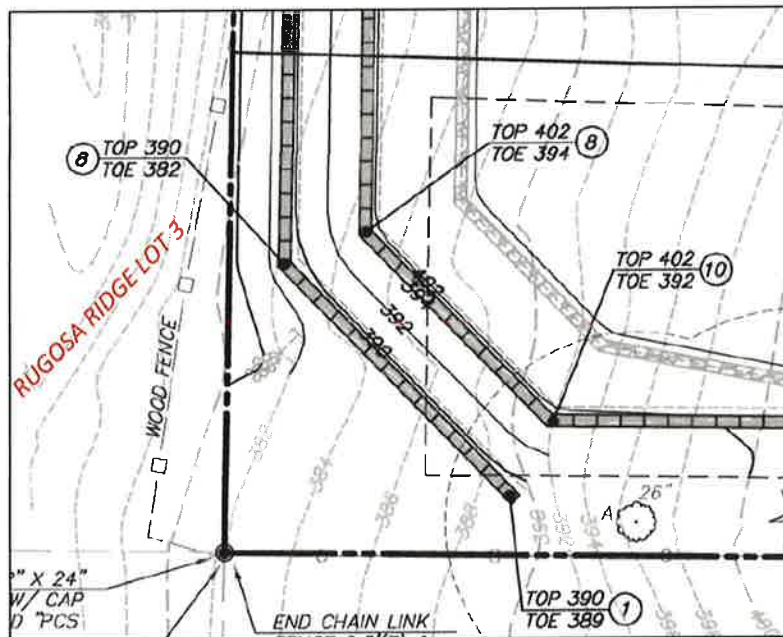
Image showing proposed retaining walls abutting Rugosa Ridge
